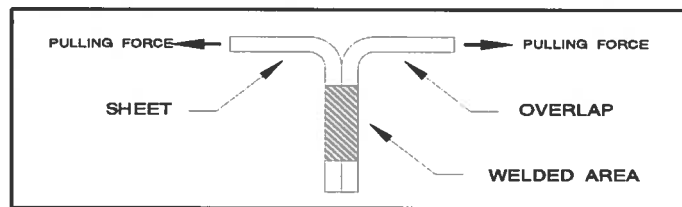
Fillet-Extruded Geomembrane Weld
